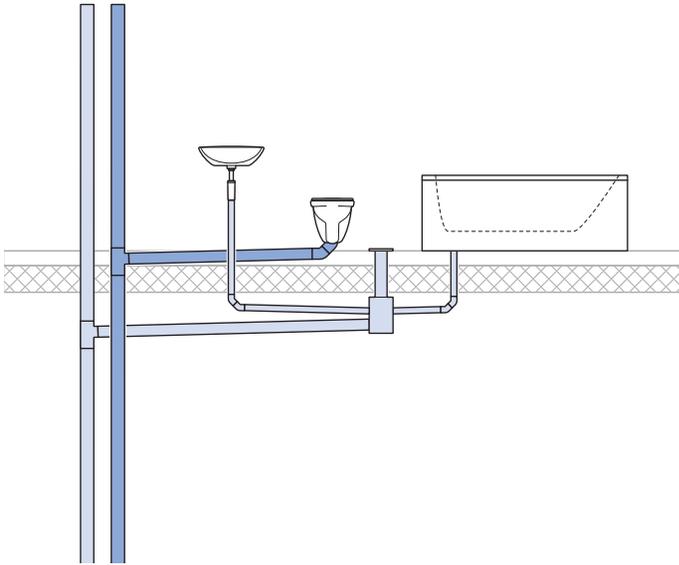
Laying the branch discharge pipe under and above the ceiling, two stacks
